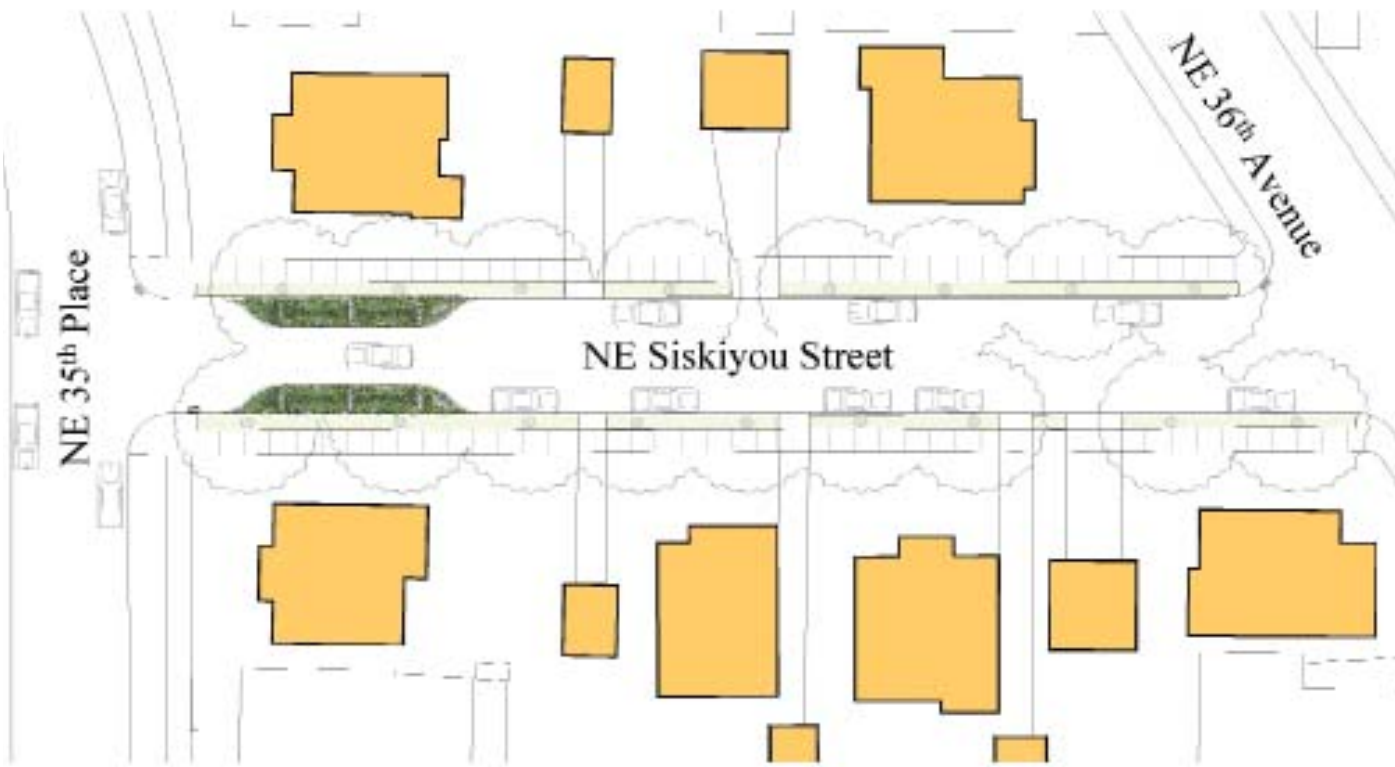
Plan view of the Siskiyou St. rain garden curb bumpouts
